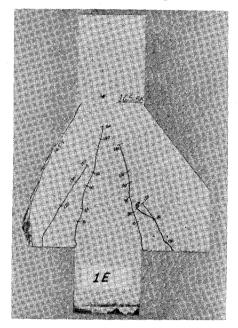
Conventionally Reinforced Corbel, Type BI, Loaded Near Outer Edge. Failure Plane Follows Bend Radius
